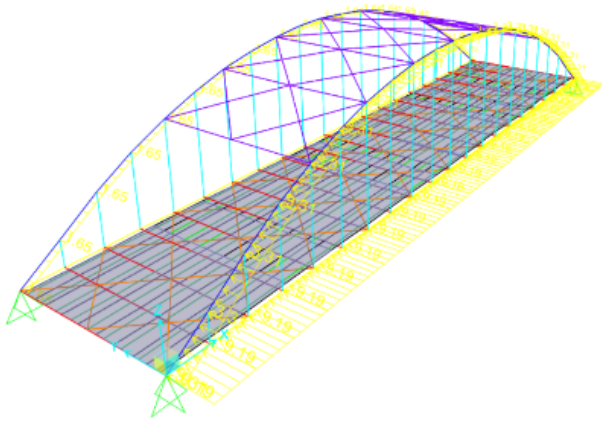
Wind Load on Structure “EWs” (Unit: kNm)
